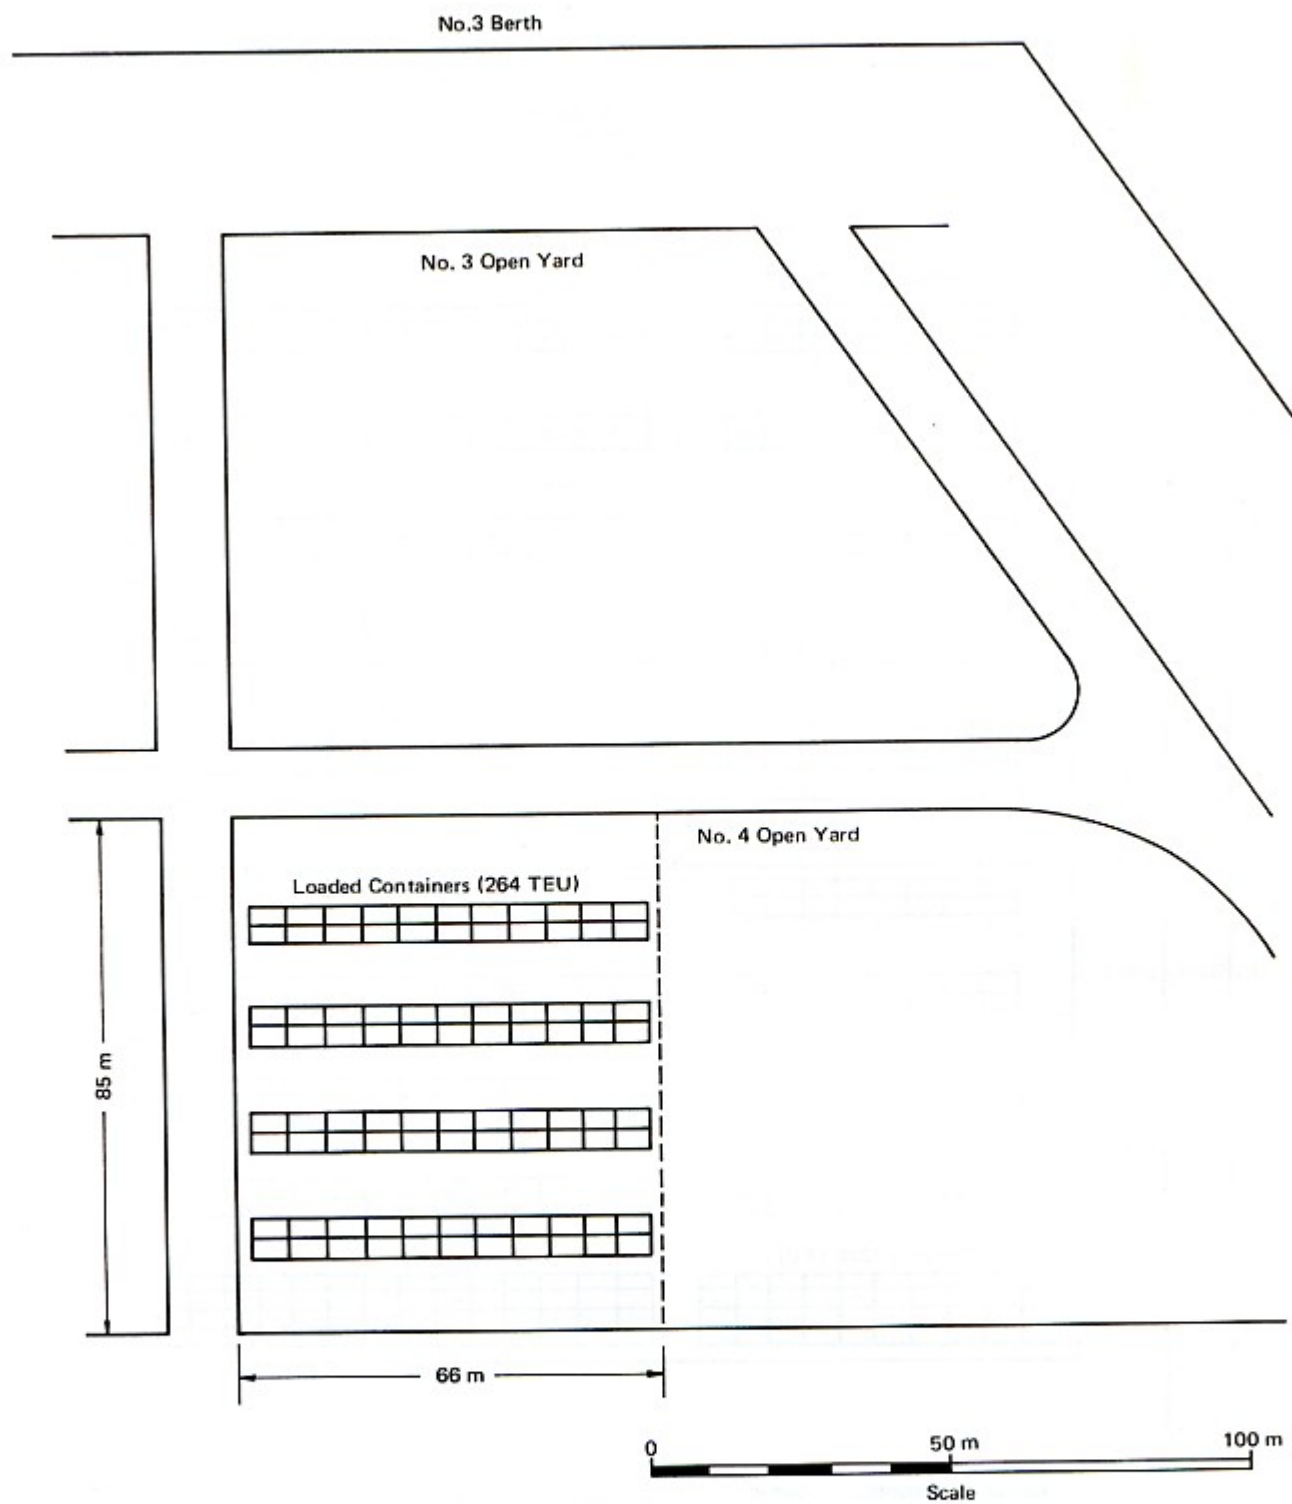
(b) Container Yard Slot Arrangement Plan
